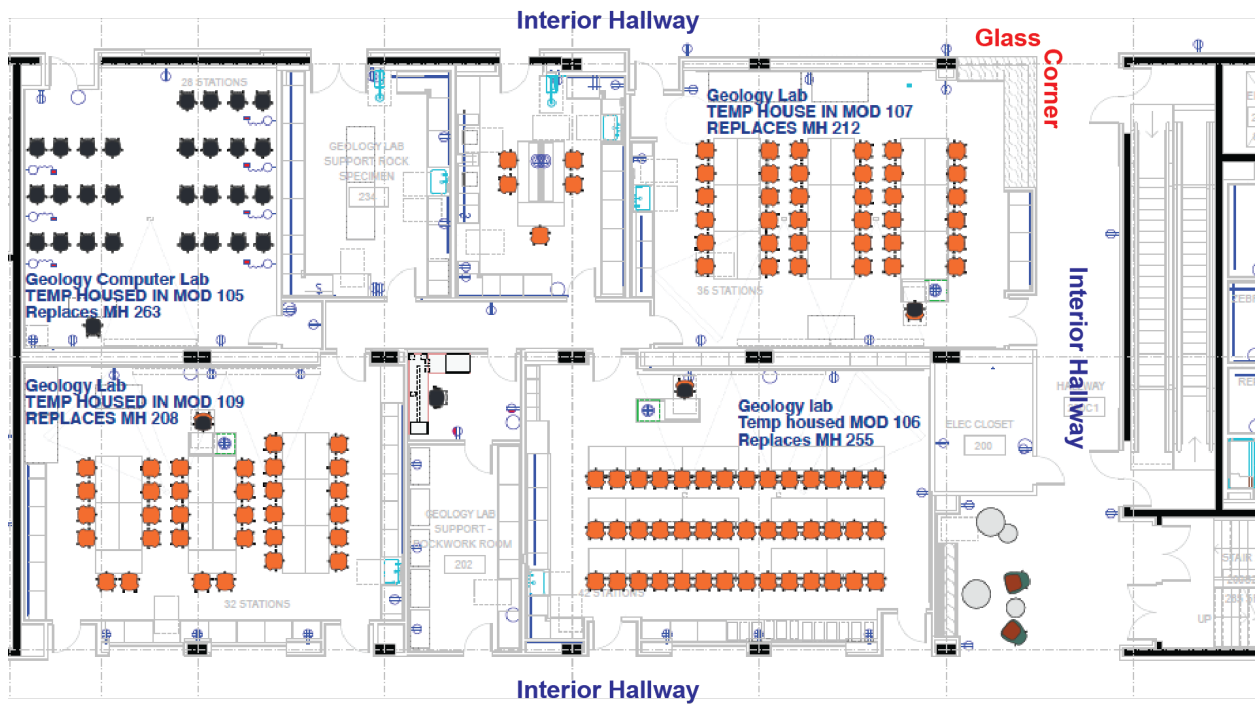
Floor plans of future classroom spaces on the 2nd floor of McCarthy Hall.
